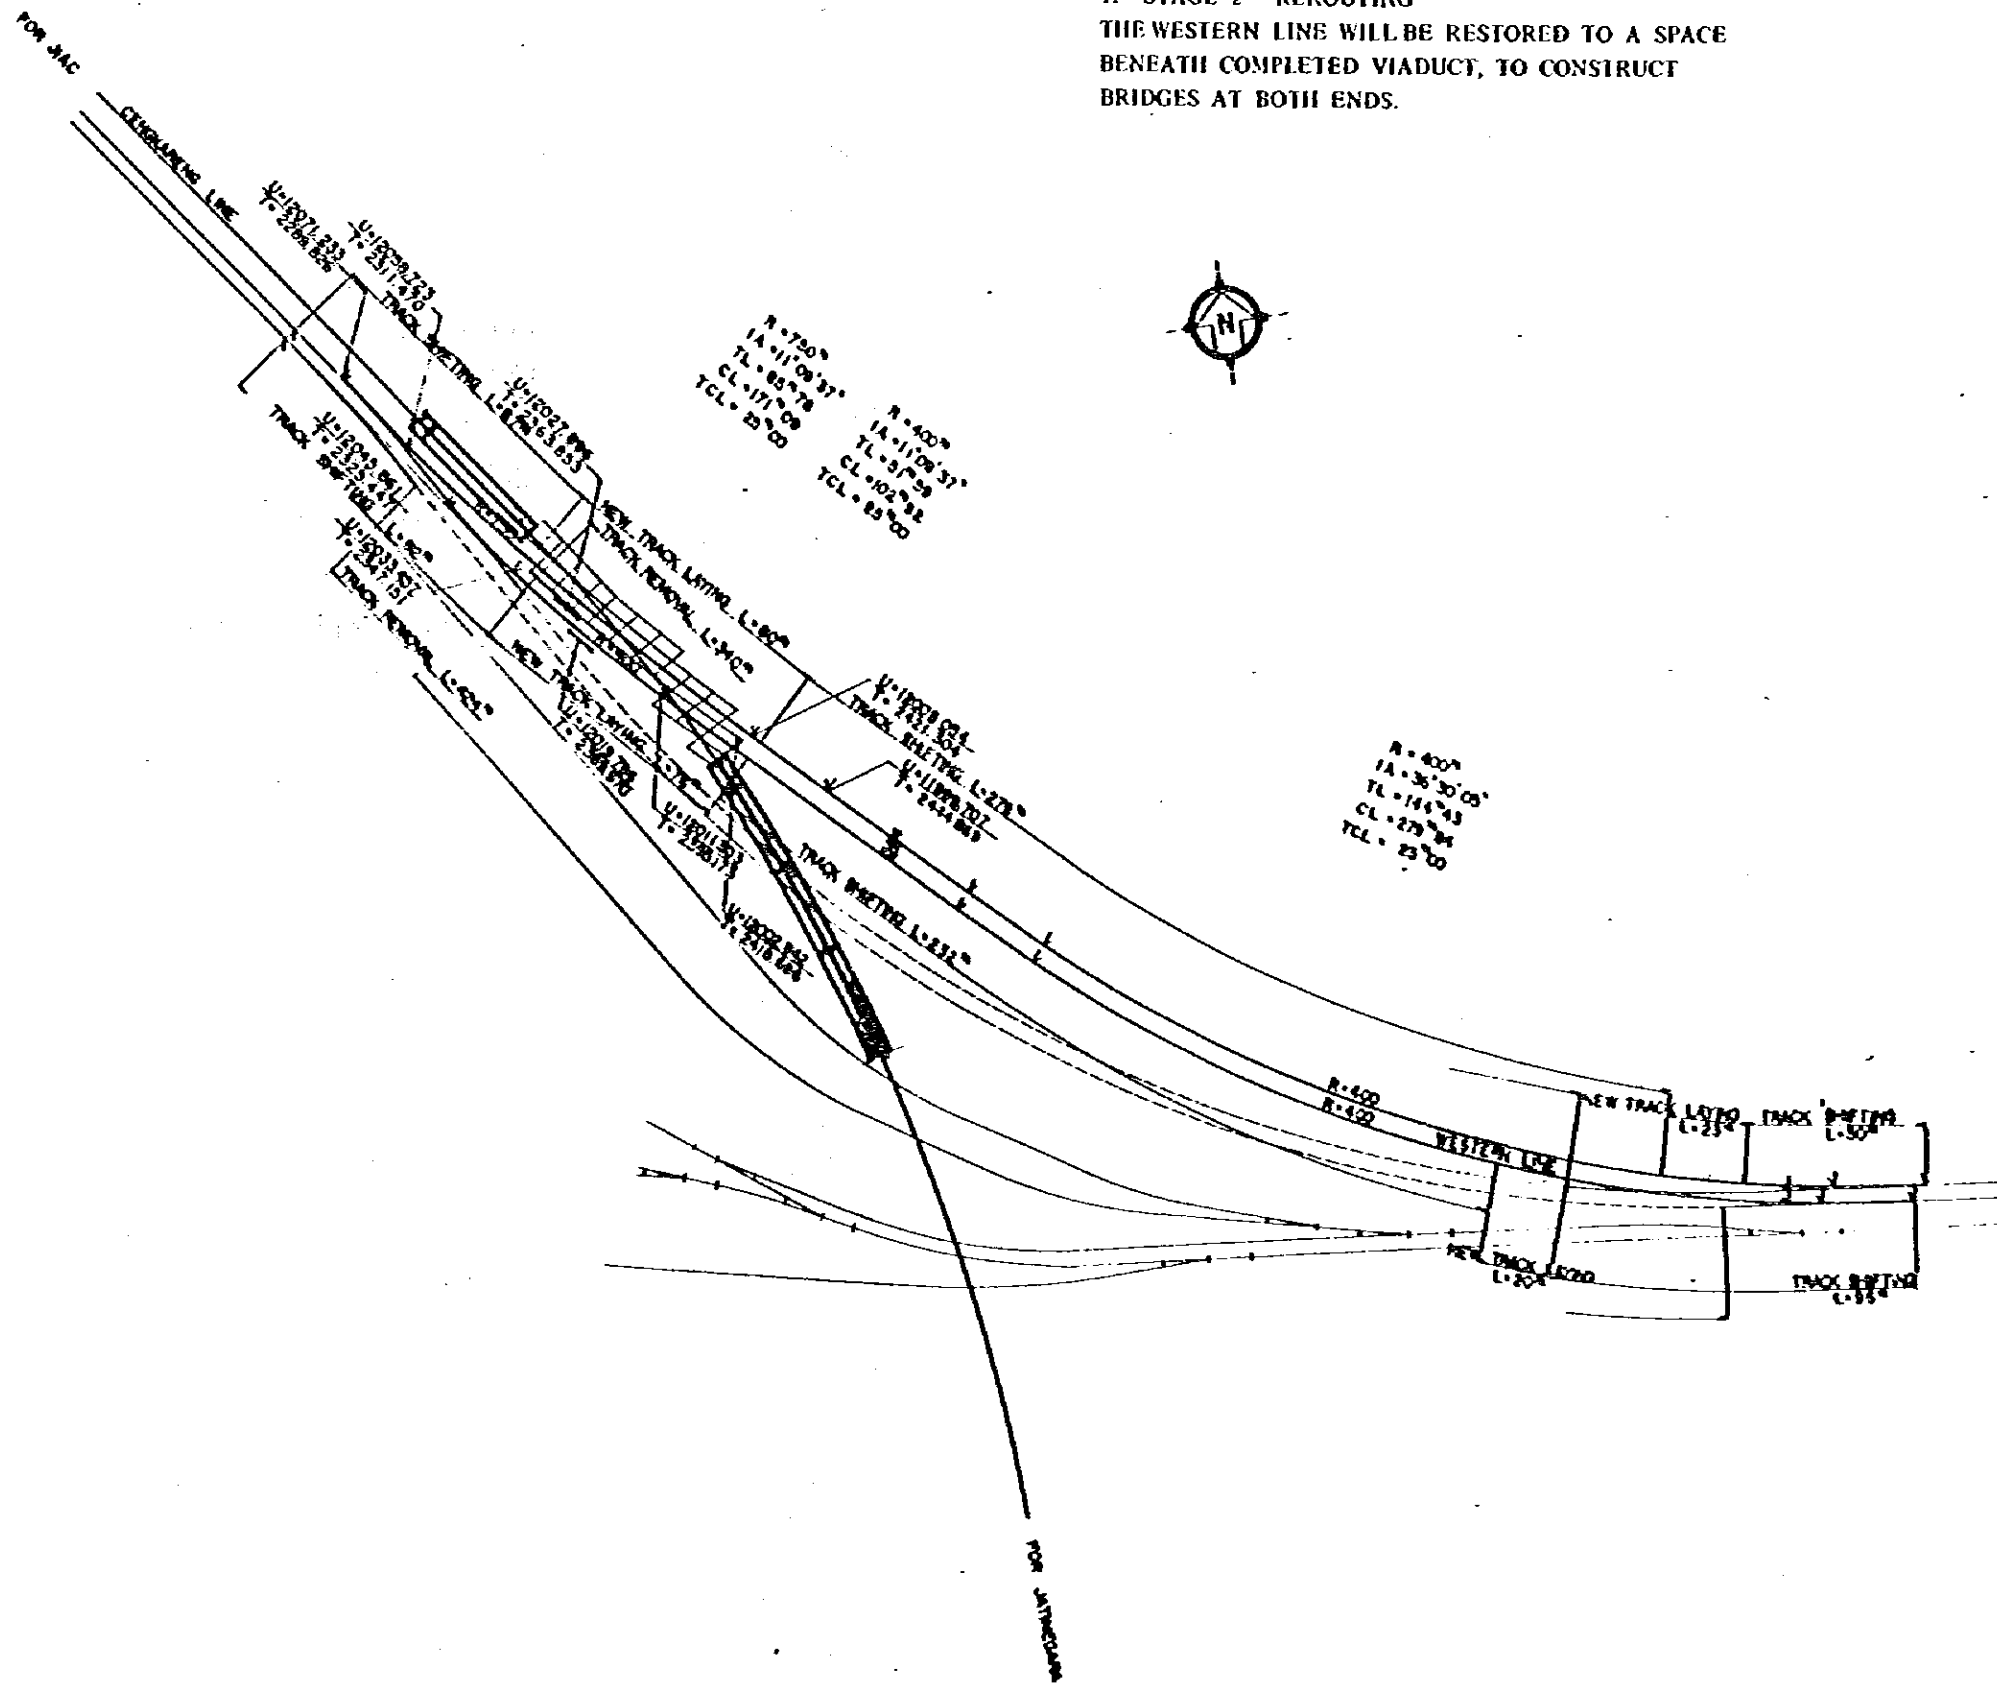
(2) Rerouting Plan at Section Overpassing Western Line and Around Gudang Freight Yard
